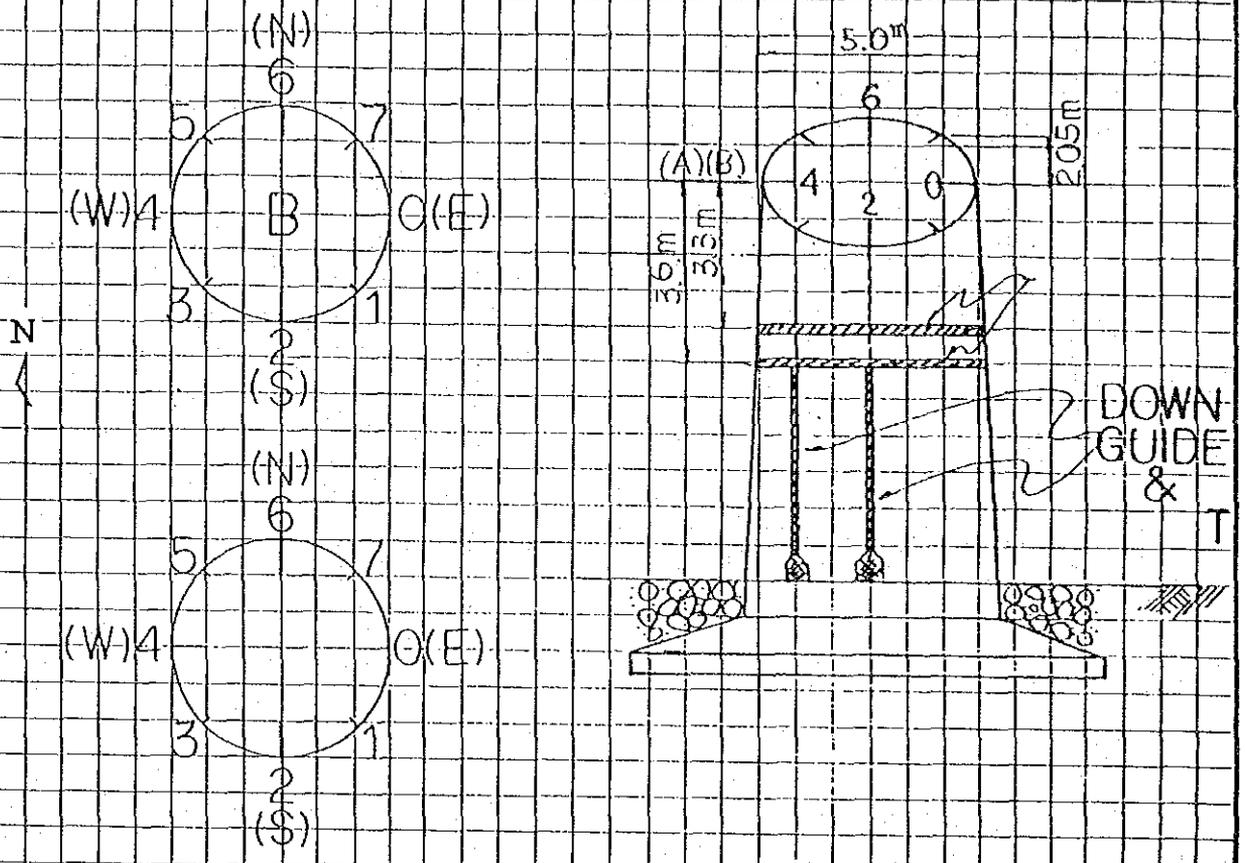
Method of Visual Inspection for Cracking at Pier 5
